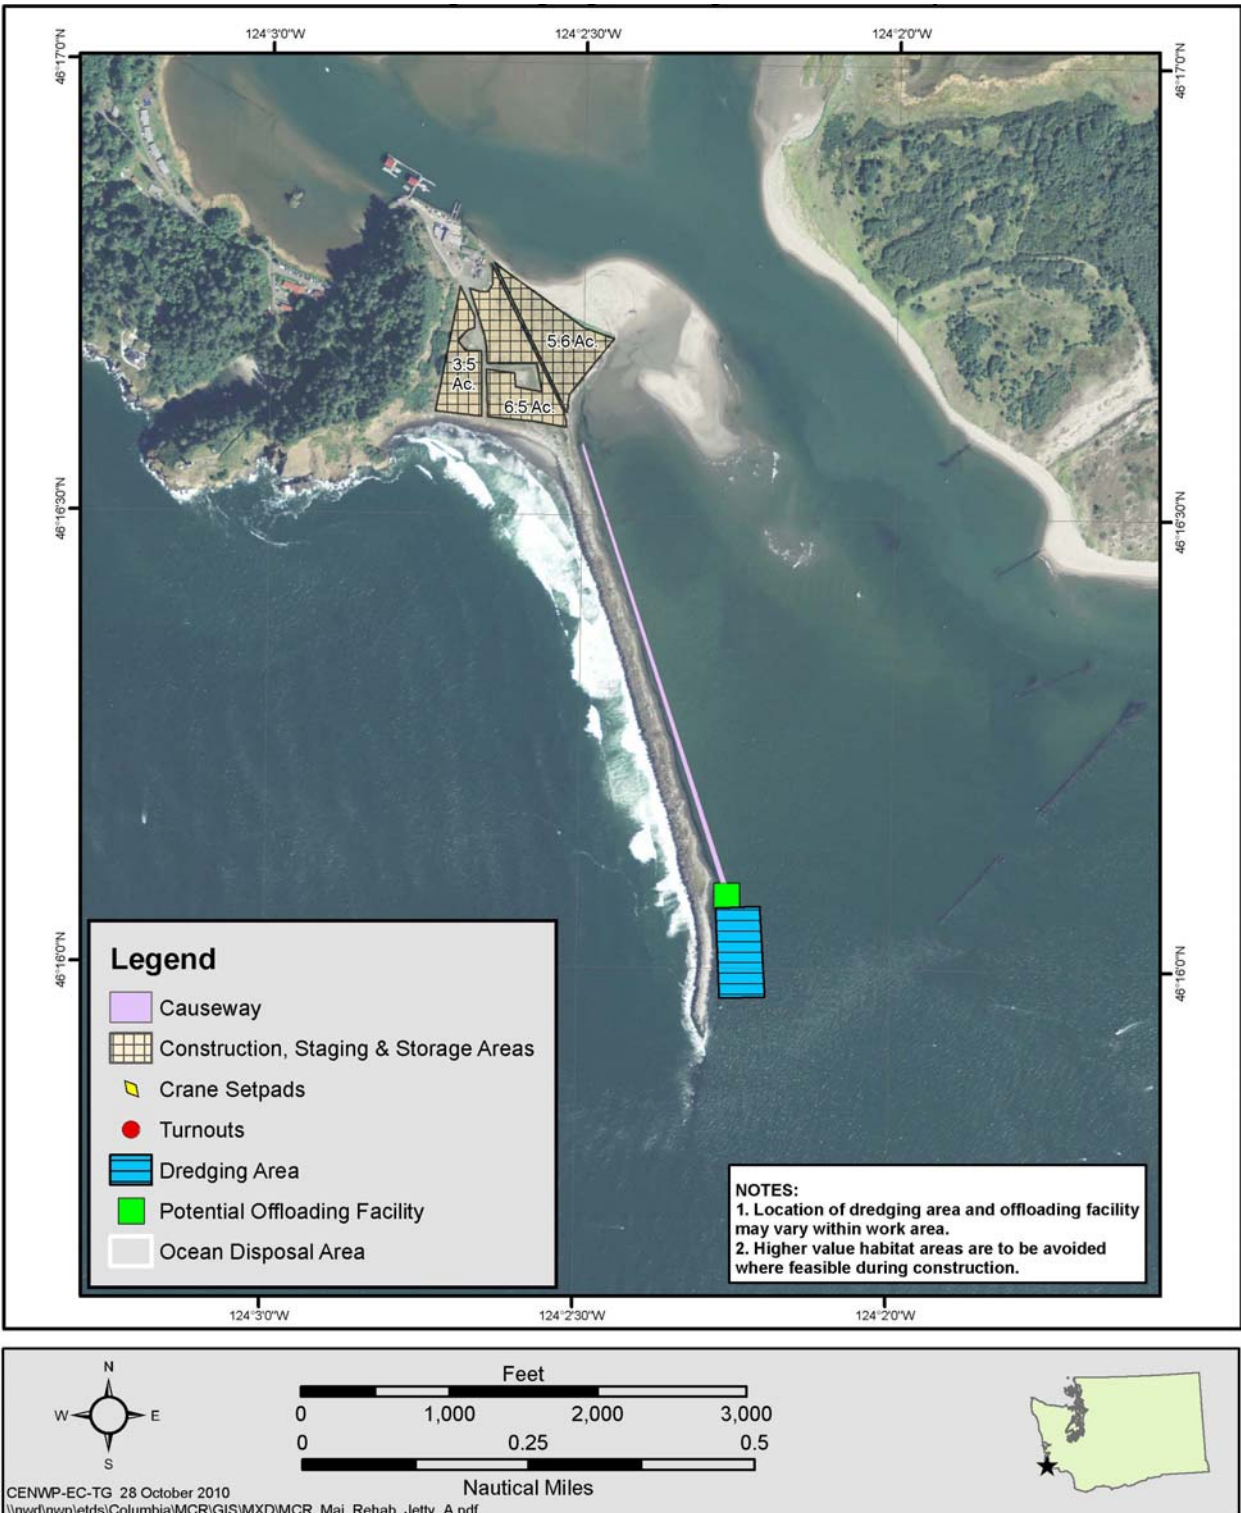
Jetty A offloading, staging, storage and causeway facilities.
